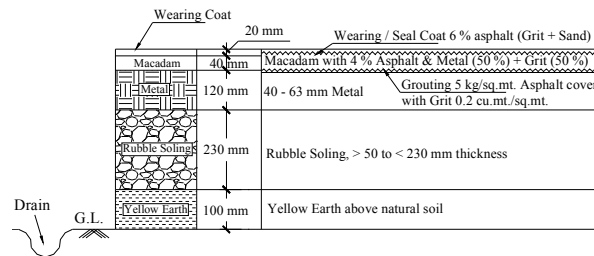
Sketch showing the typical pavement composition executed by SMC pre 1995.
